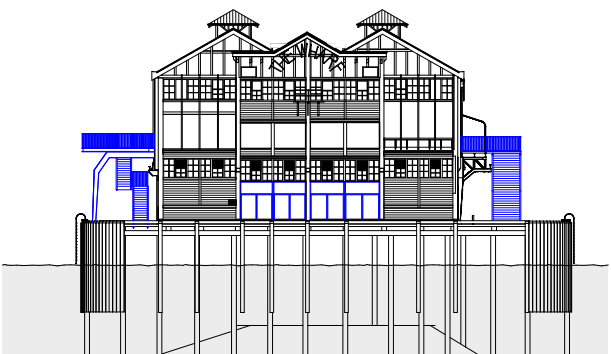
Proposed north elevation Wharf 4/5, (alterations shown in blue).
